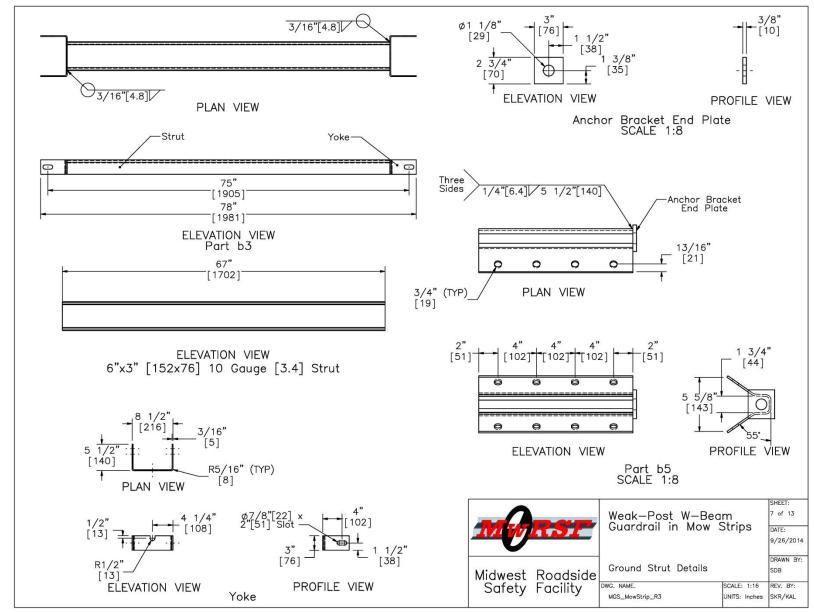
Anchorage Components Details, Test No. MGSMS-1
